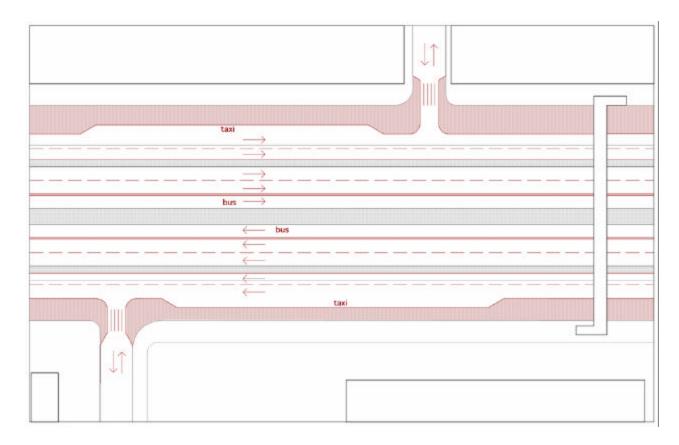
Proposed widened sidewalk w/ waiting area for taxi and bajaj at Benhil.
